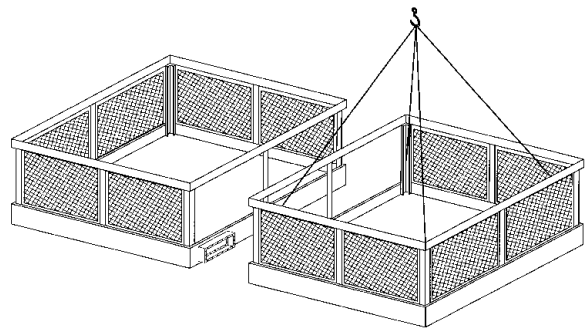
Equalizer Flume Rigging Detail. Models UBT 8-324B through 8-924B. Models UBT 8-536B through 8-936B have three bottom sections and two equalizer flumes.
